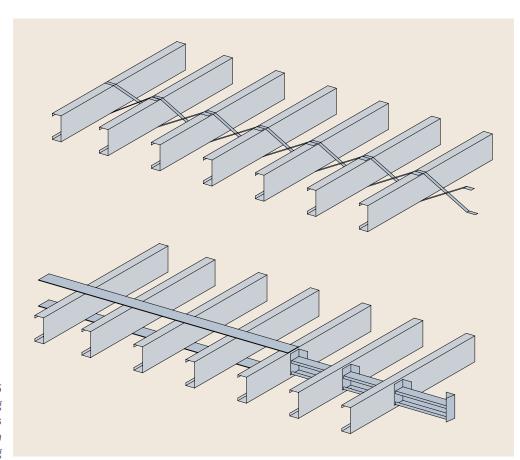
Generic bridging and blocking details for joists with a suspended ceiling
